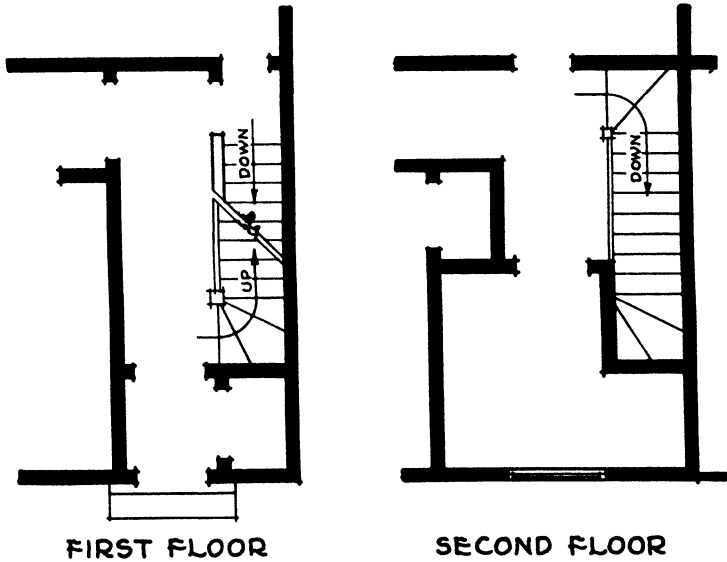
Plan of Stair with Two Turns (Double L Stair)
